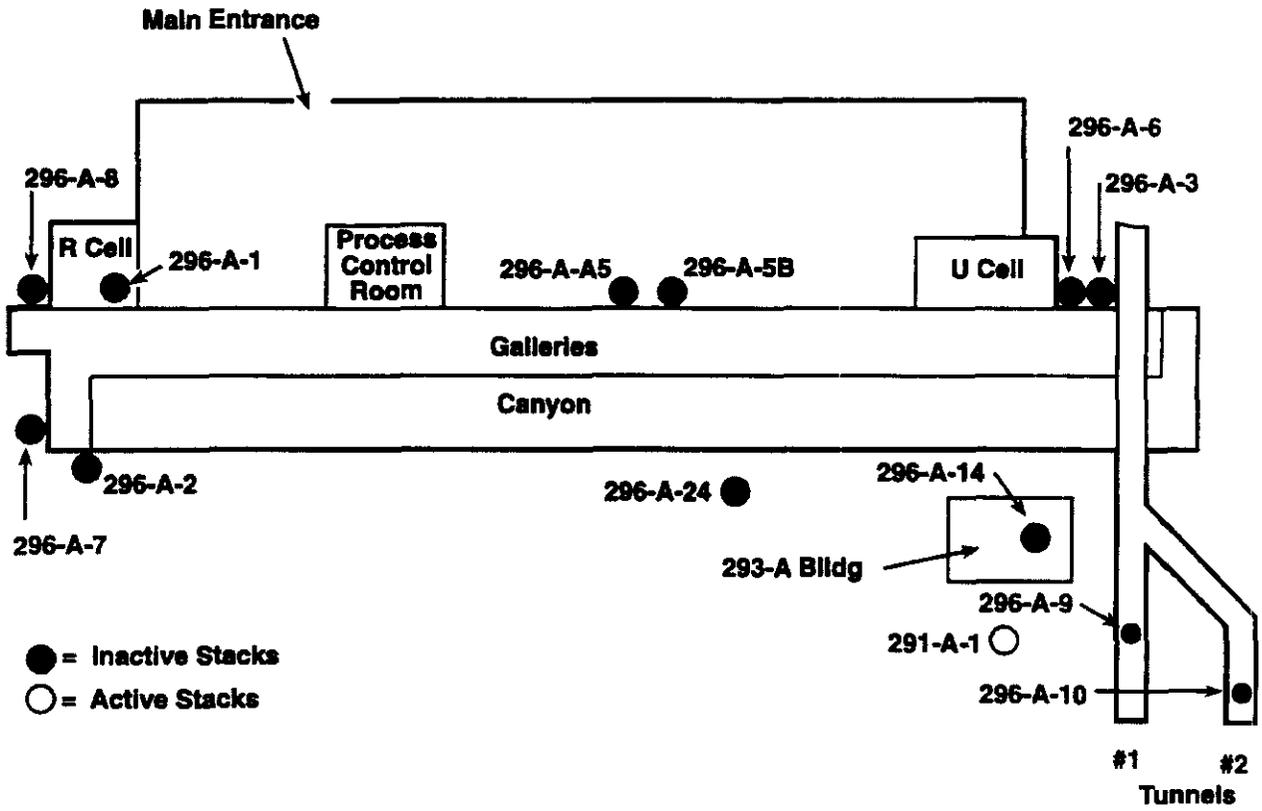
PUREX Facility Surveillance and Maintenance Site Plan
